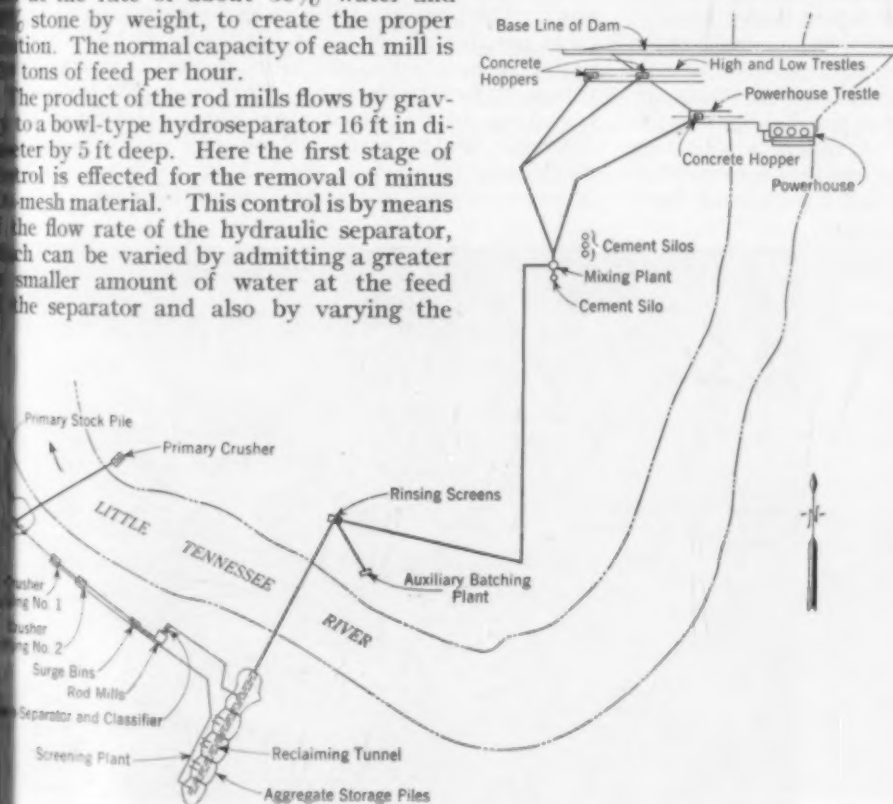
CONSTRUCTION PLANT FACILITIES AT FONTANA PROJECT
